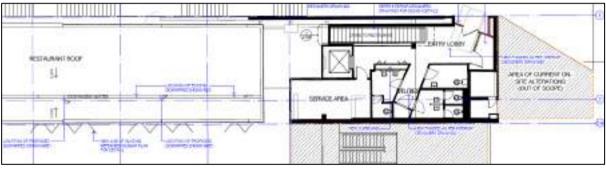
Works Plan extract (Source: BJB Architects, 2024)
